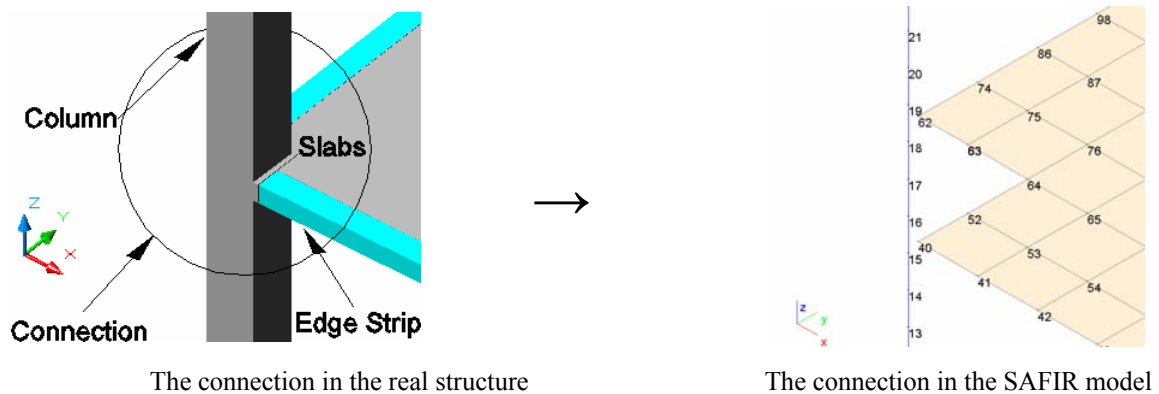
Modelling of the connection among the column, slabs and edge strips of the slab
